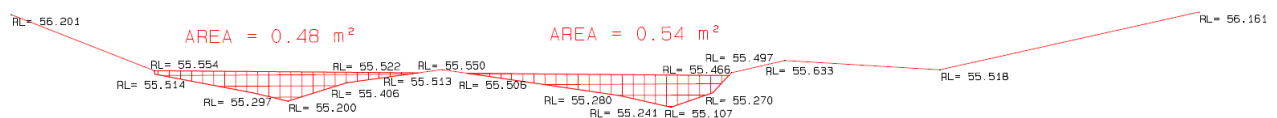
SBT4 Discharge Site – South Creek Survey Cross Section
